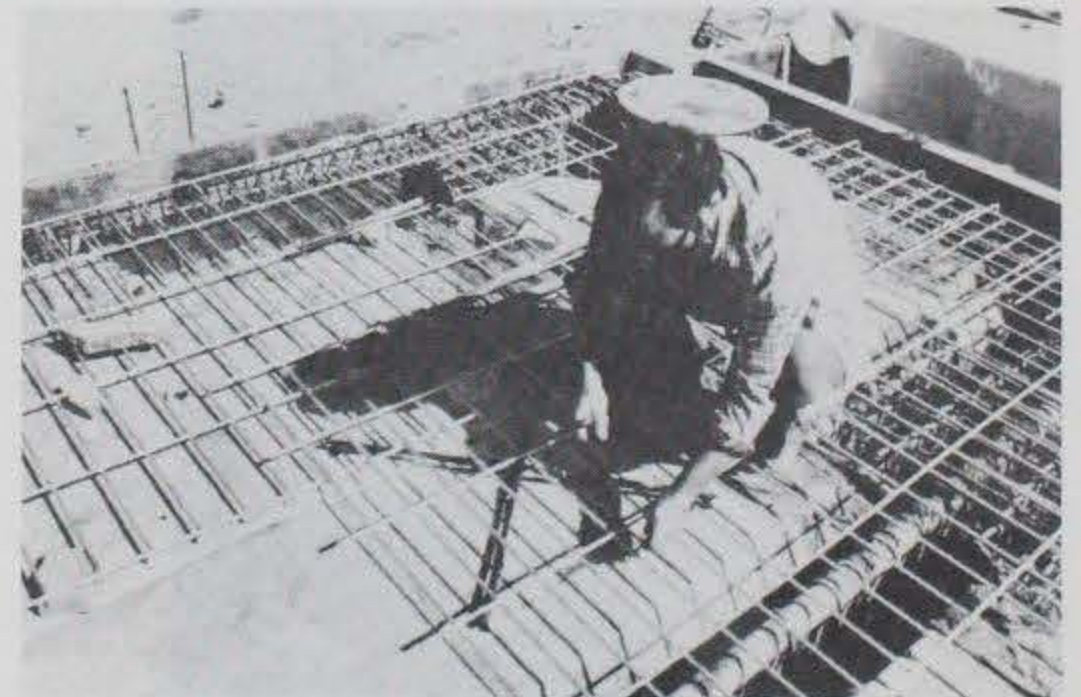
Strain gages being placed in deck during construction of concrete float.
